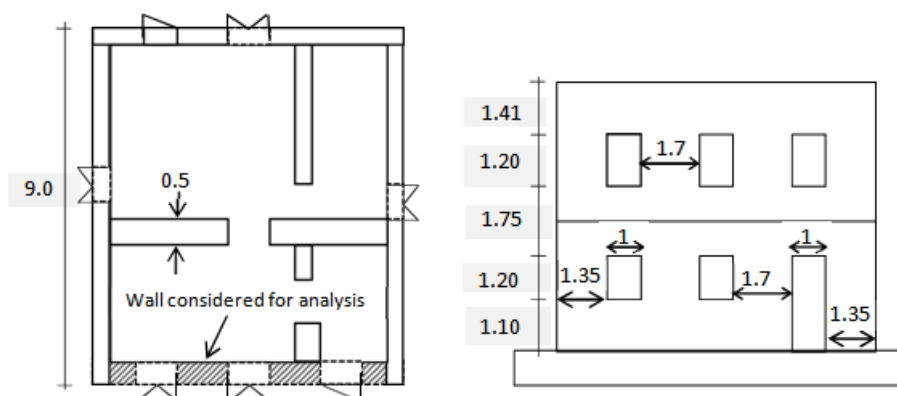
(a) Plan and (b) Elevation of selected stone masonry building (Pasticier et al. 2008)
